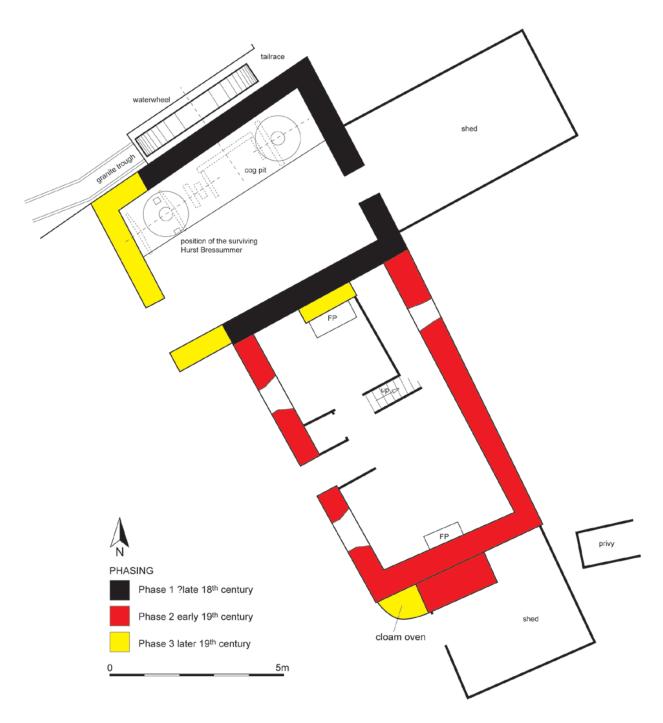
Phased ground floor plan, based on existing architect's plans, and showing a reconstruction of the mill machinery.
